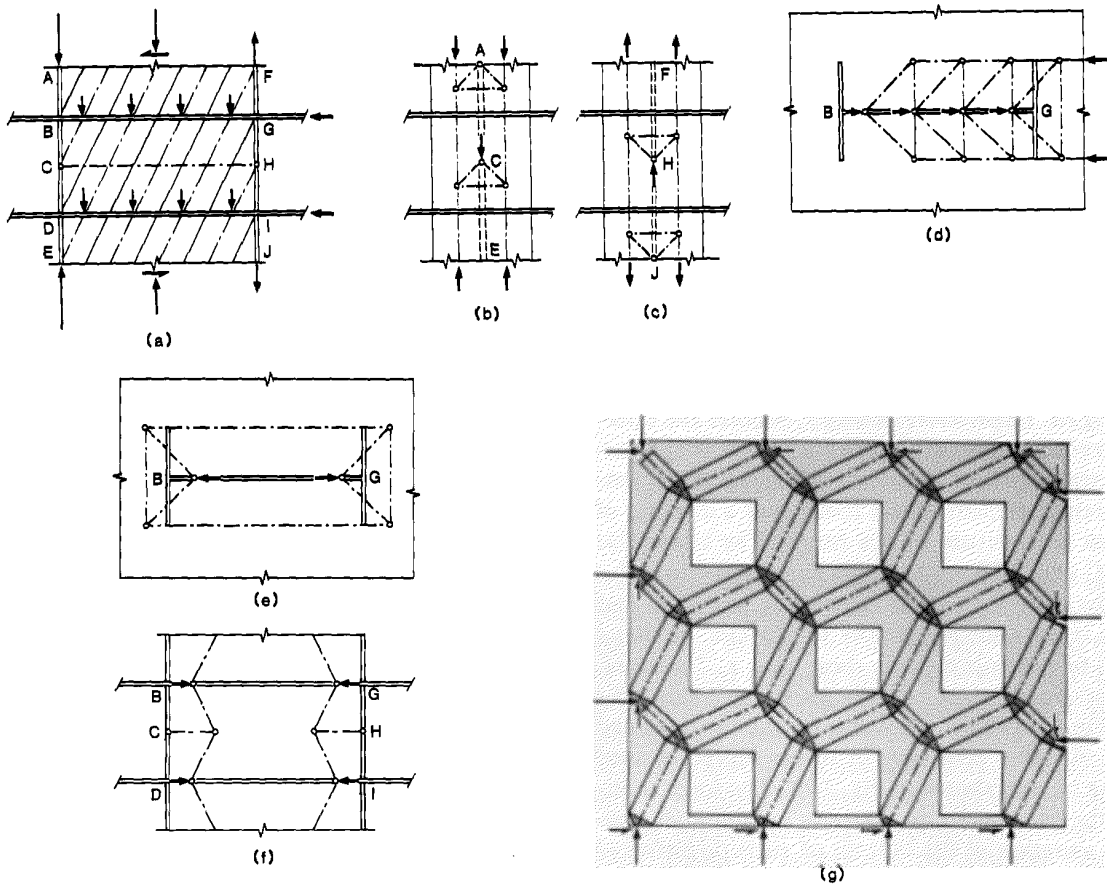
Strut and tie action in shearwalls: (a) Truss model of web of I-shaped wall; (b) Truss model of compression flange; (c) Truss model of tension flange; (d) Truss model of force transfer in floor slab; (e) Truss model of floor slab acting as external stirrup of web; (f) Truss model showing effect of external stirrup action on web; (g) Strut action in shearwall with openings
